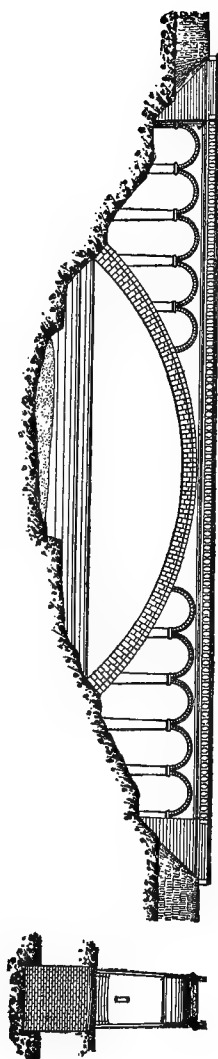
Elevation of the Antoinette bridge, and transverse section of the viaduct with little arches.
